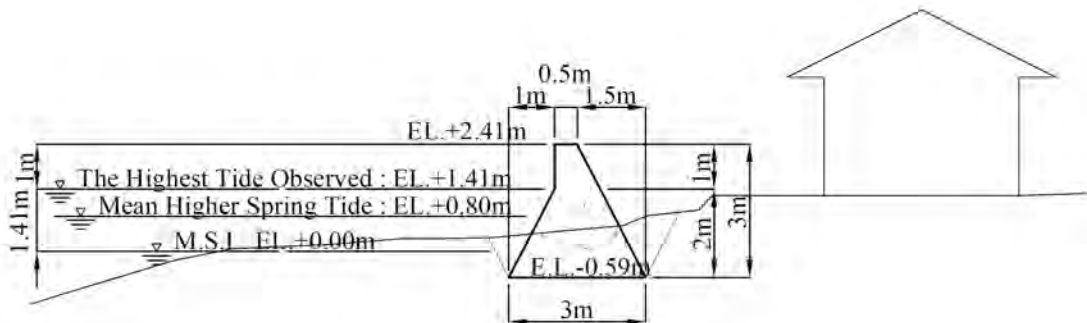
Typical Cross Section of Coastal Dike Type B: Parapet Wall
